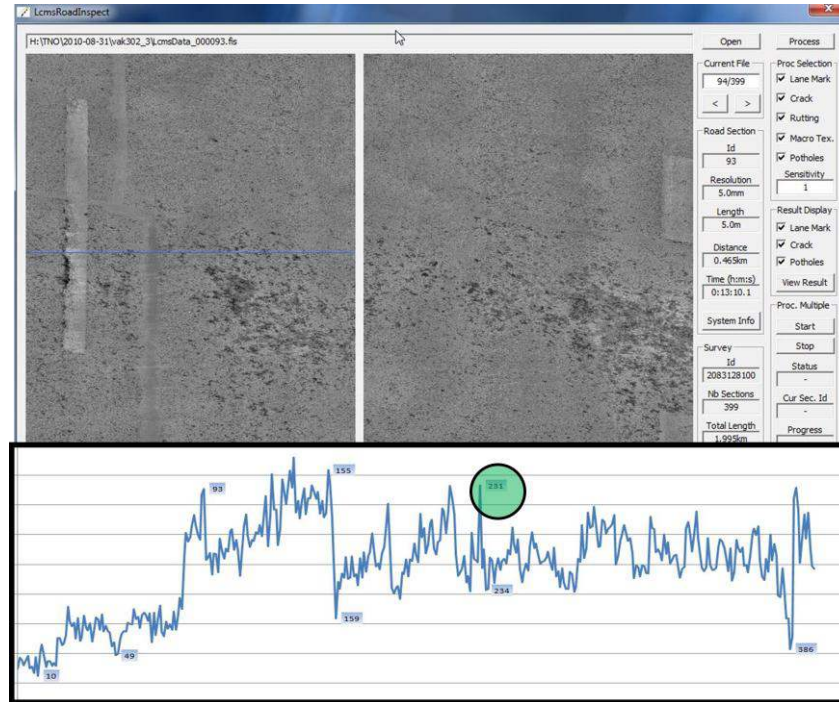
Example of high RI road section on porous asphalt roads in the Netherlands.
